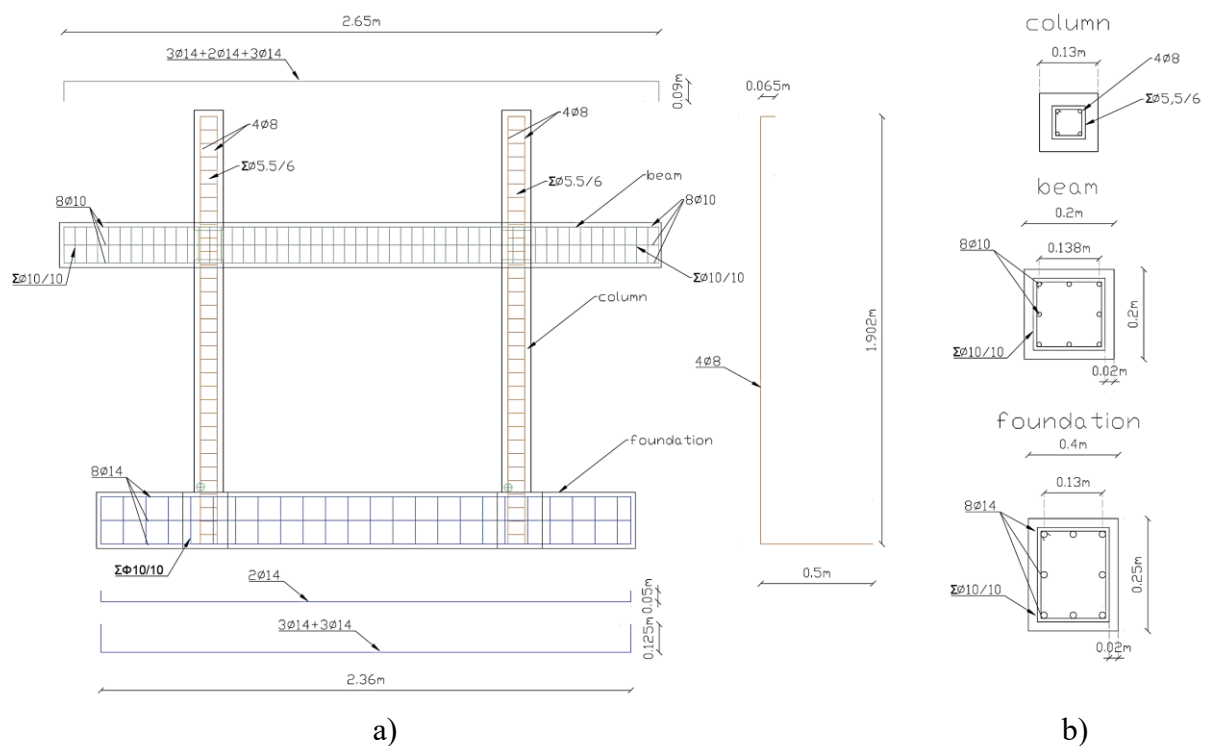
Reinforcement of the specimen a) section view b) cross-section details.
